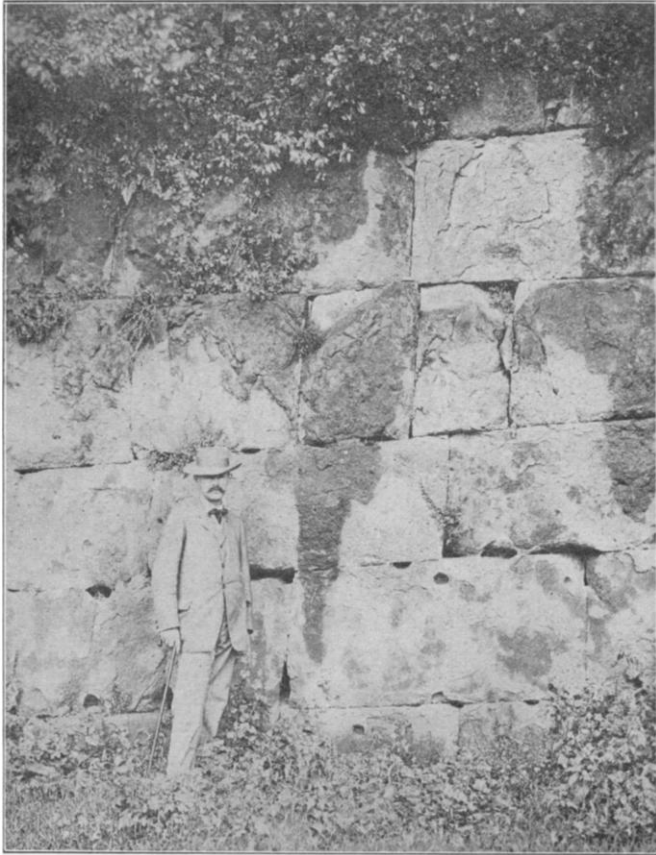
RETAINING WALL BY THE ROAD FROM ASTURA
